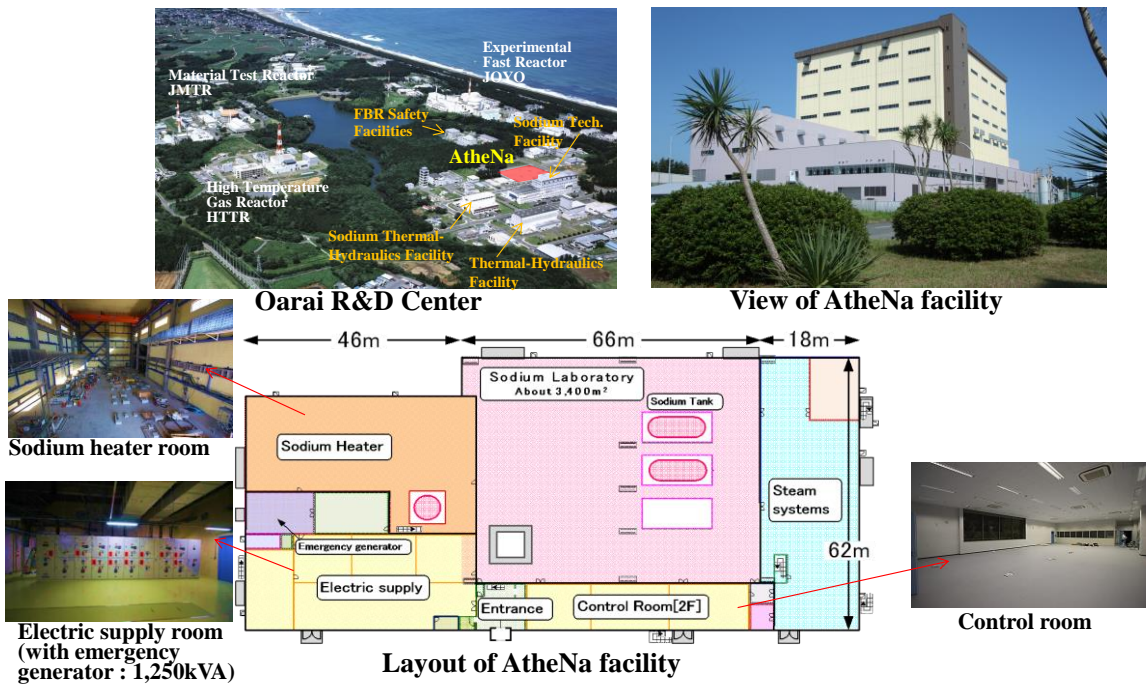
View of the AtheNa facility and its current status. Building completed in Jan. 2012
